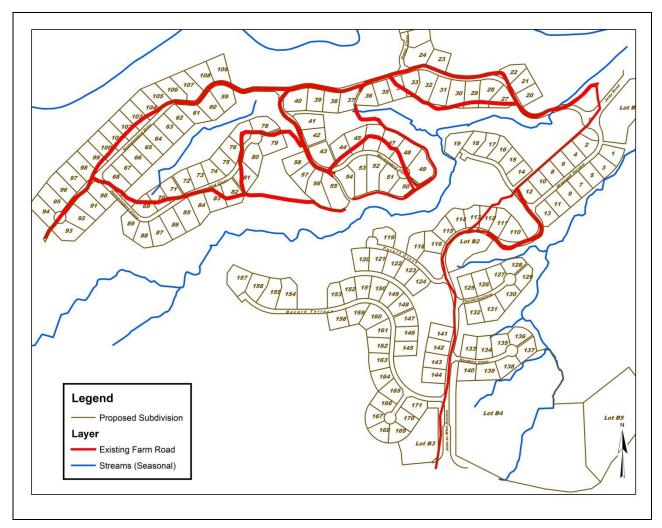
Alignment of Sub-Division Roads with Existing Farm Roads
